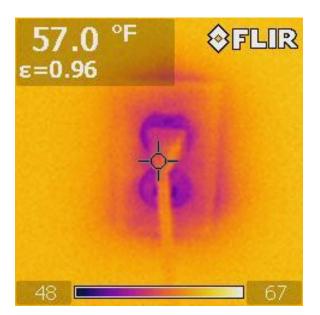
Infiltration Detection—Wall Outlet on Exterior Wall
